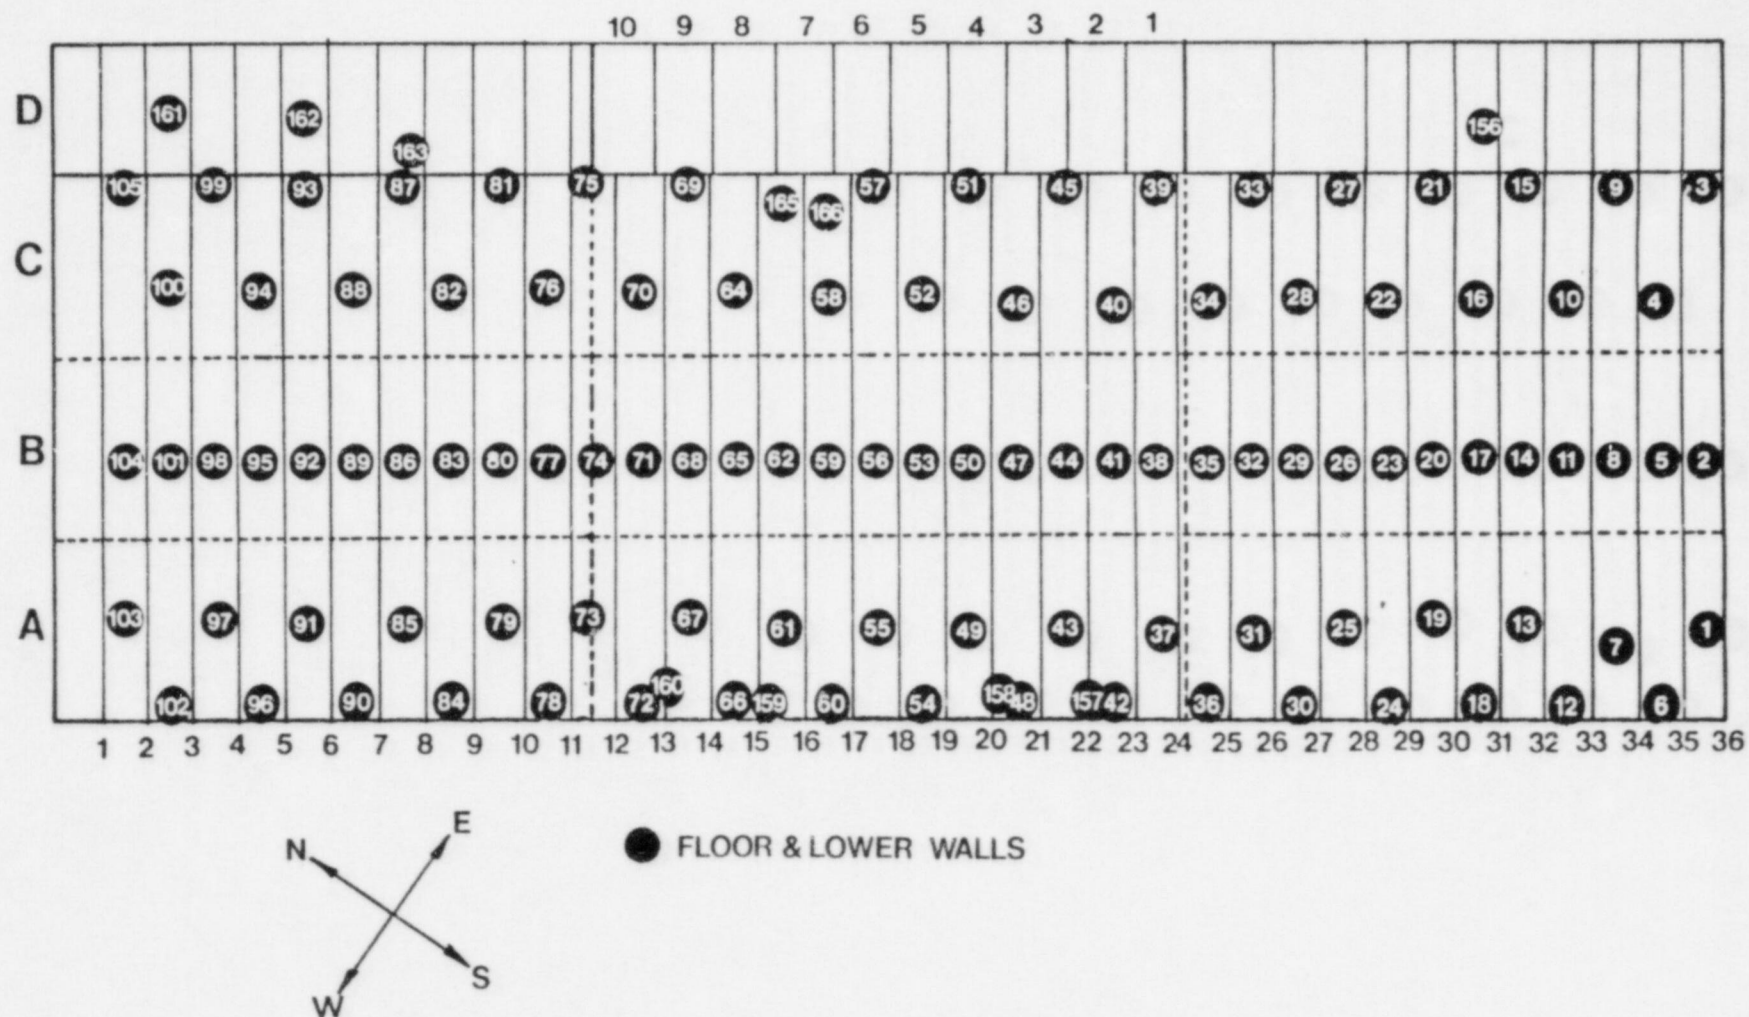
A: Floor Plan of the Alloy Building Indicating Locations of Measurements and Smears (Floor and Lower Walls)
